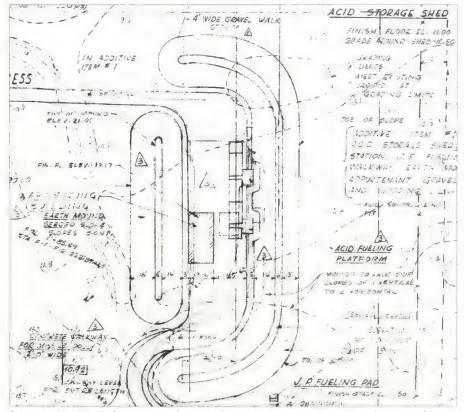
Detail of earth mounds in Missile Maintenance Area, "NIKE" Project, Launching Area, Launching Area Site Plan. To protect the site from an accidental detonation after a missile was armed with its three warheads, two engineered earthworks were constructed on the north and south sides of the Warheading Building. The plans labels both "earth mound, seeded slopes, top elevation of mound = 21.00, slopes 3 in 1" (GATE 11048).
